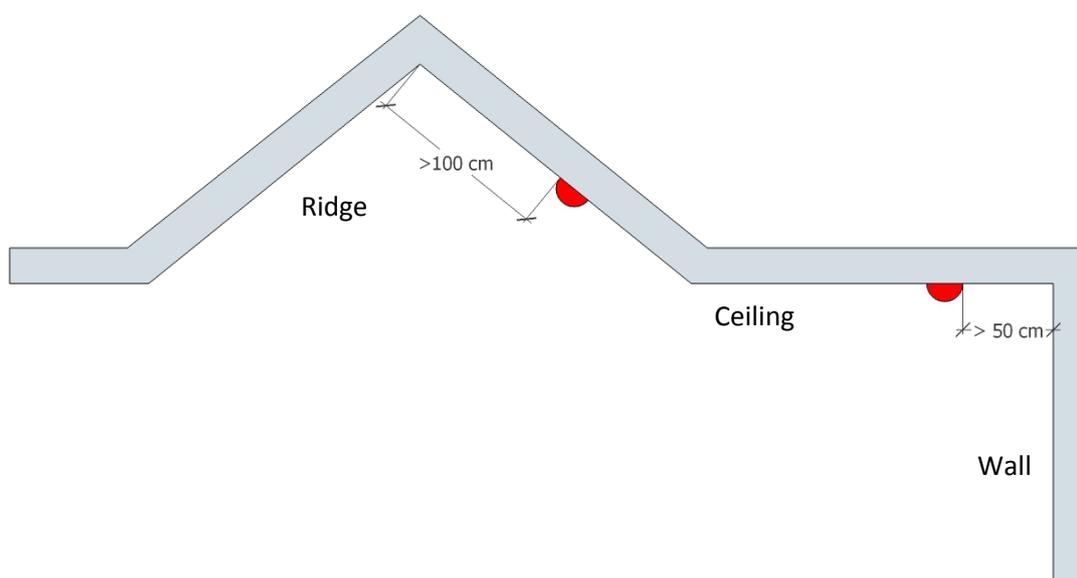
NBF recommends a minimum distance of 50 cm between the smoke detector and the wall, and minimum 100 cm between the ridge and the detector (marked red) if it is installed on a slanting ceiling.
